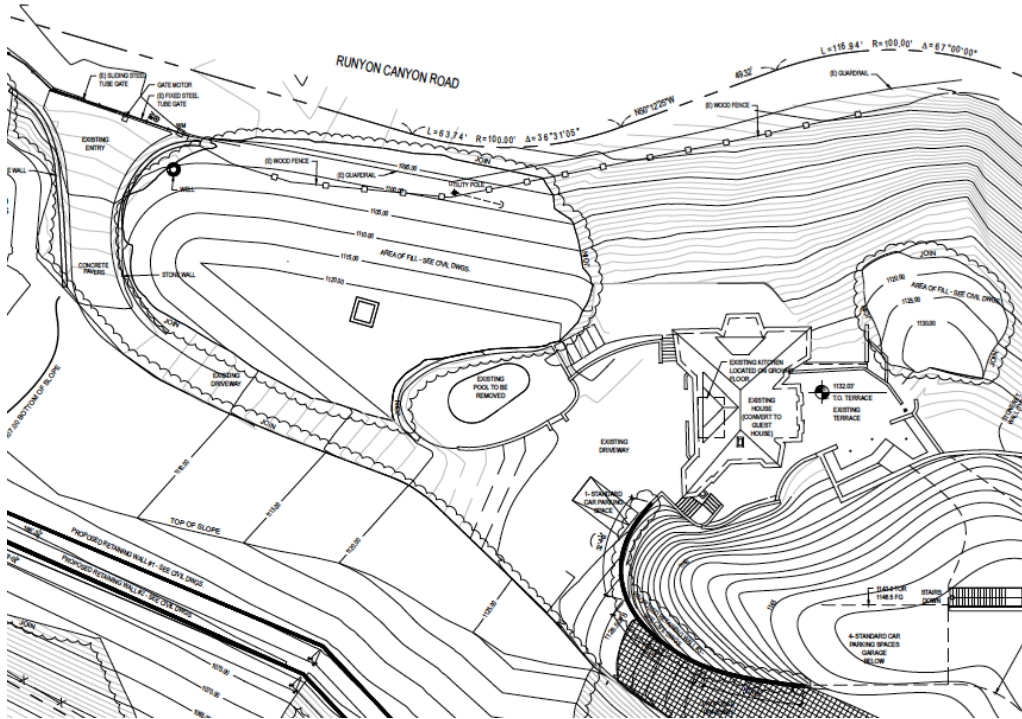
Location of Pool To Be Removed, Retaining Wall #3 and Fill-Sites (DEIR Figure II-1 Detail) In Relation to Historic Residence
